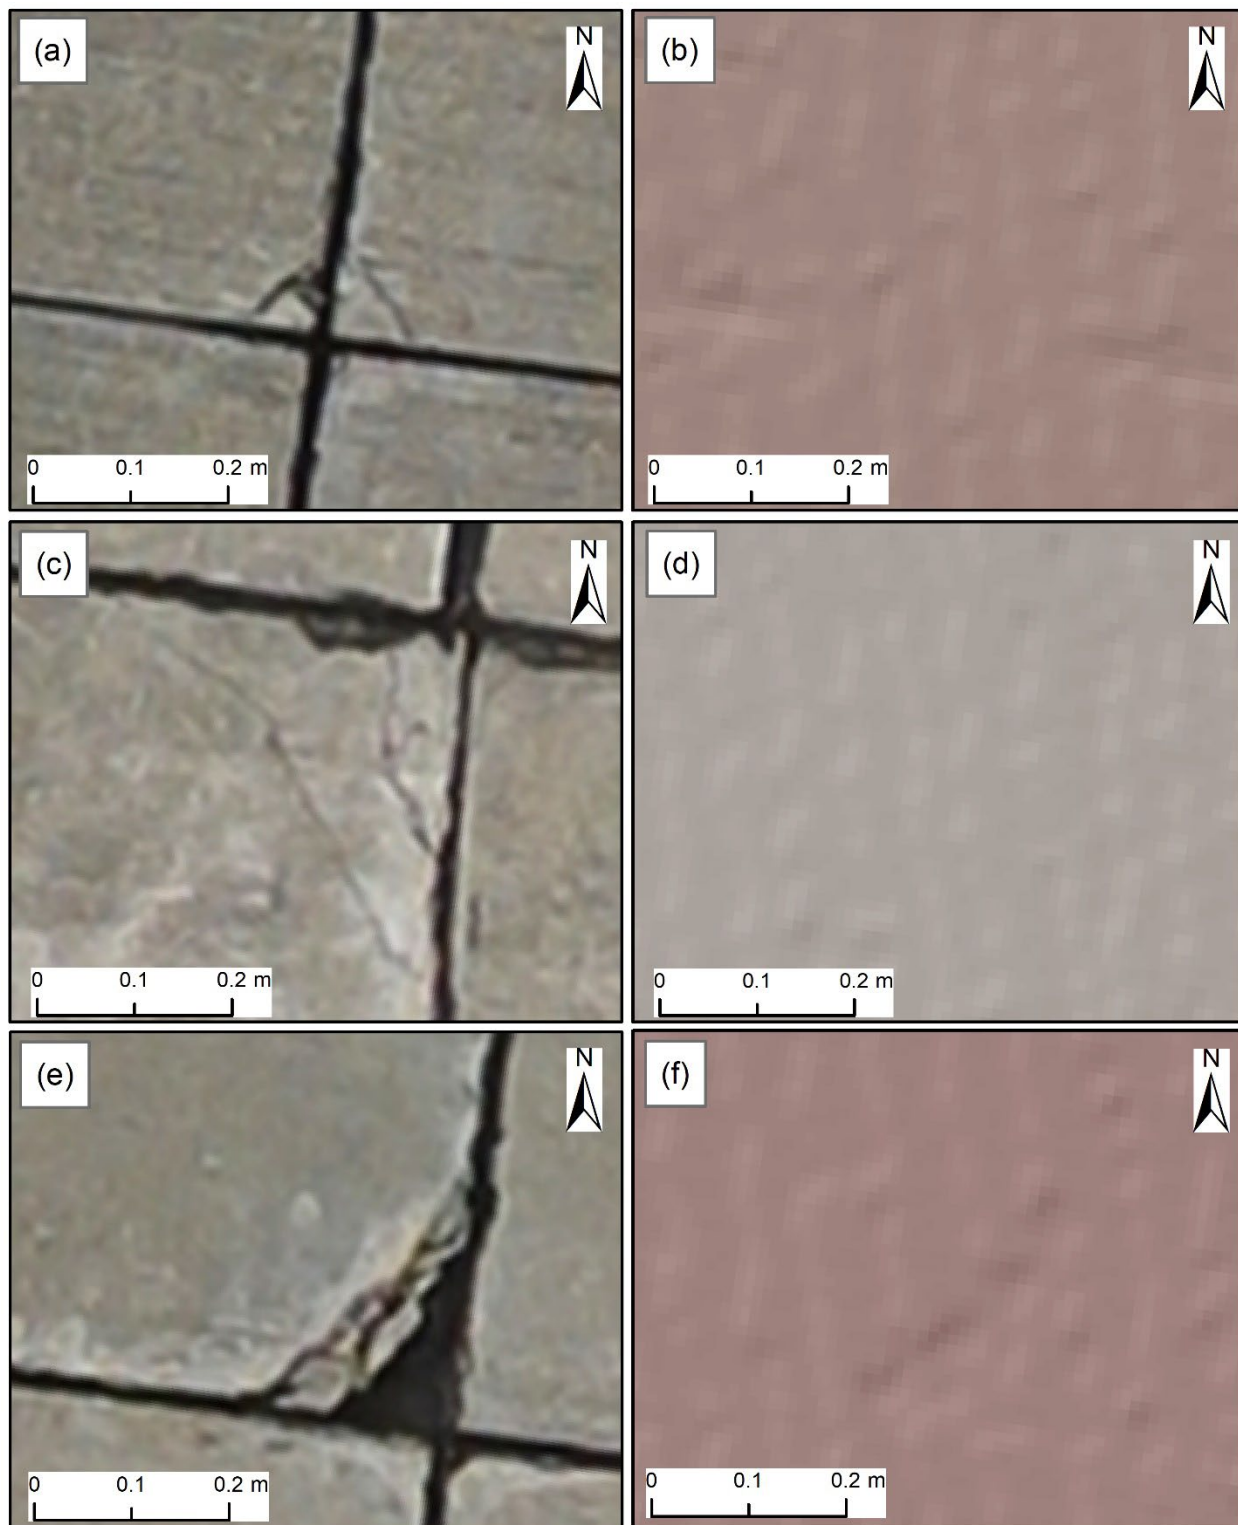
Corner Spalling (L) in (a) 2.5-mm/pix Orthophoto and (b) 10-mm/pix DEM; Corner Spalling (M) in (c) 2.5-mm/pix Orthophoto and (d) 10-mm/pix DEM; and Corner Spalling (H) in (e) 2.5-mm/pix Orthophoto and (f) 10-mm/pix DEM
